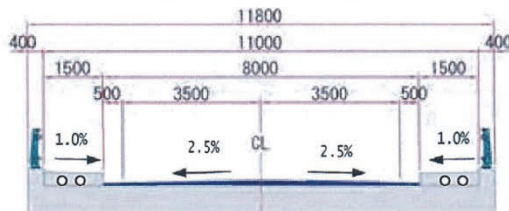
Bridge Formation (Same formation of Sekong Bridge)
